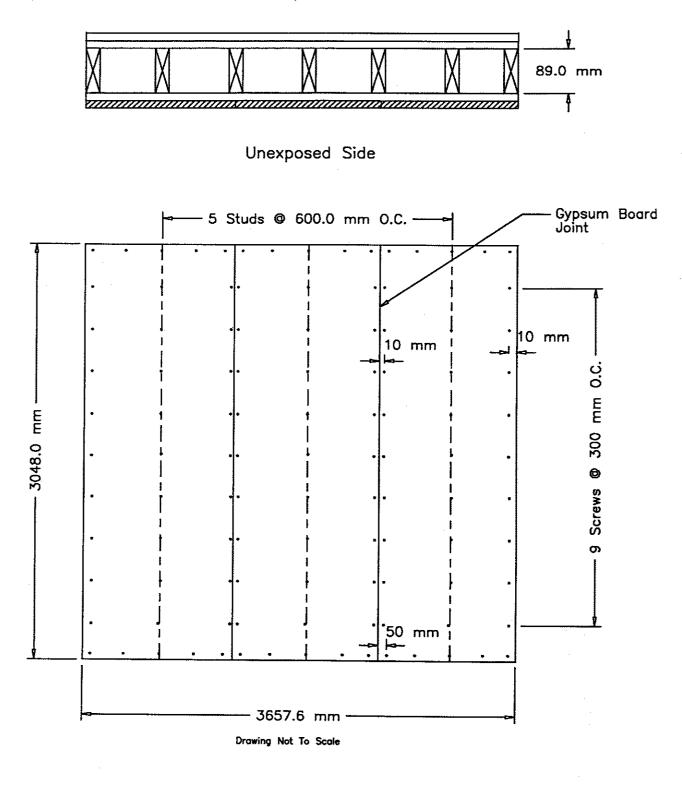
Screw Locations For Wood Stud (600 mm O.C.), 2x2 Gypsum Board Layers, Full-Scale Assembly, Face Layer Gypsum Board, Unexposed Face
